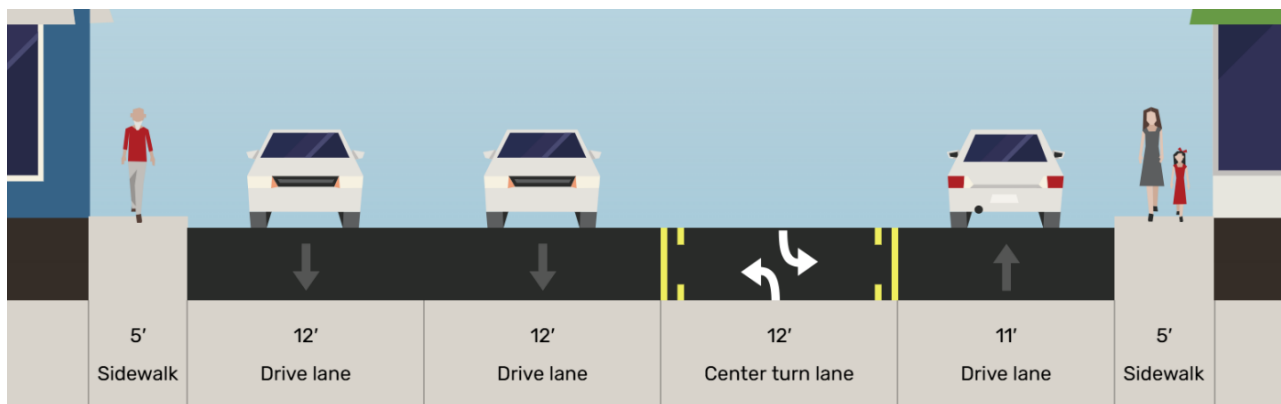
BROADWAY - 28TH STREET TO 20TH STREET
